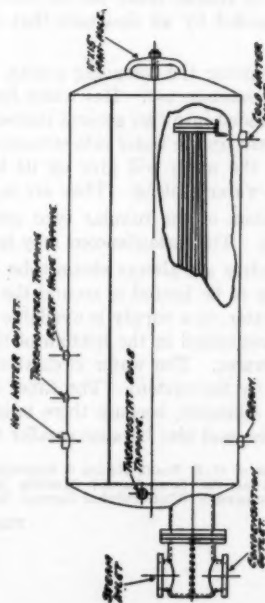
STRAIGHT TUBE STORAGE TANK HEATER
